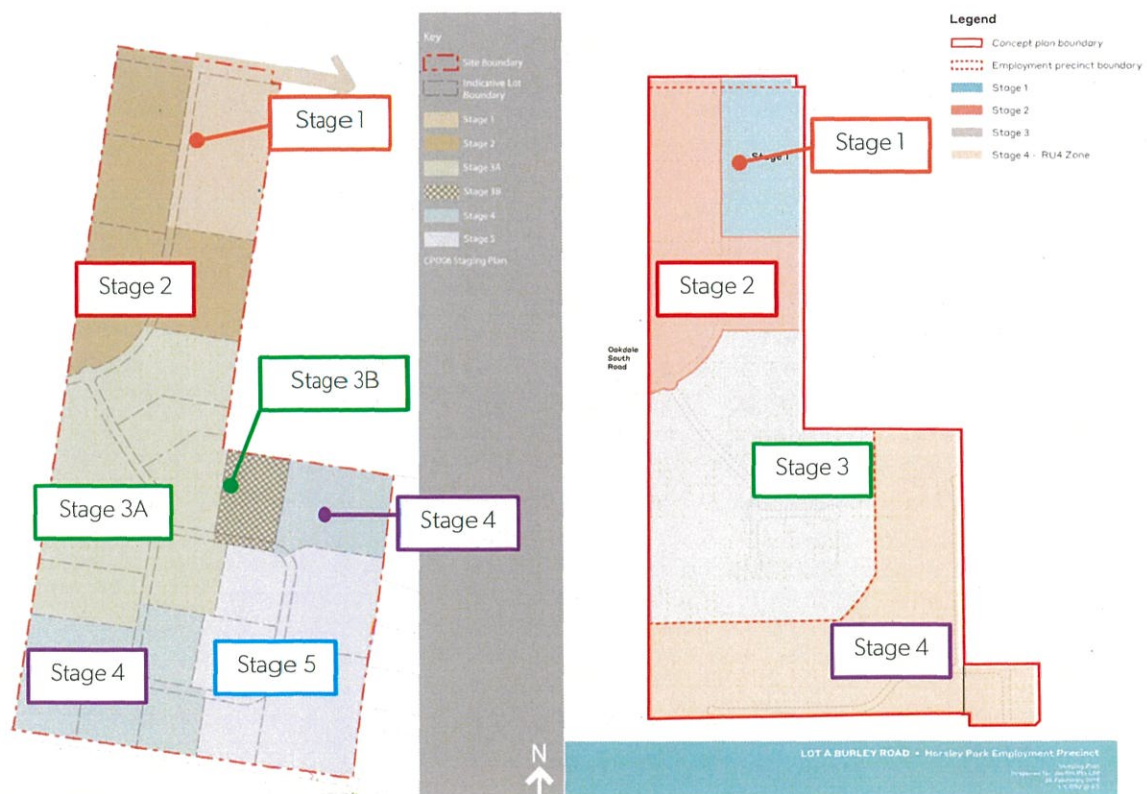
| Approved staging plan (left) and proposed staging plan (right)
